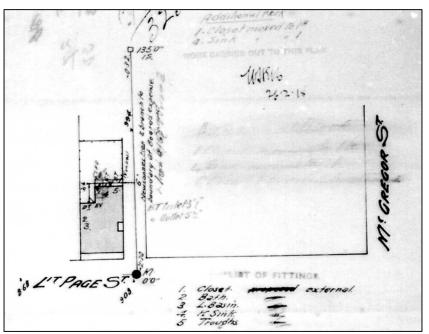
Property service plan showing the site in 1912. Source: South East Water.
